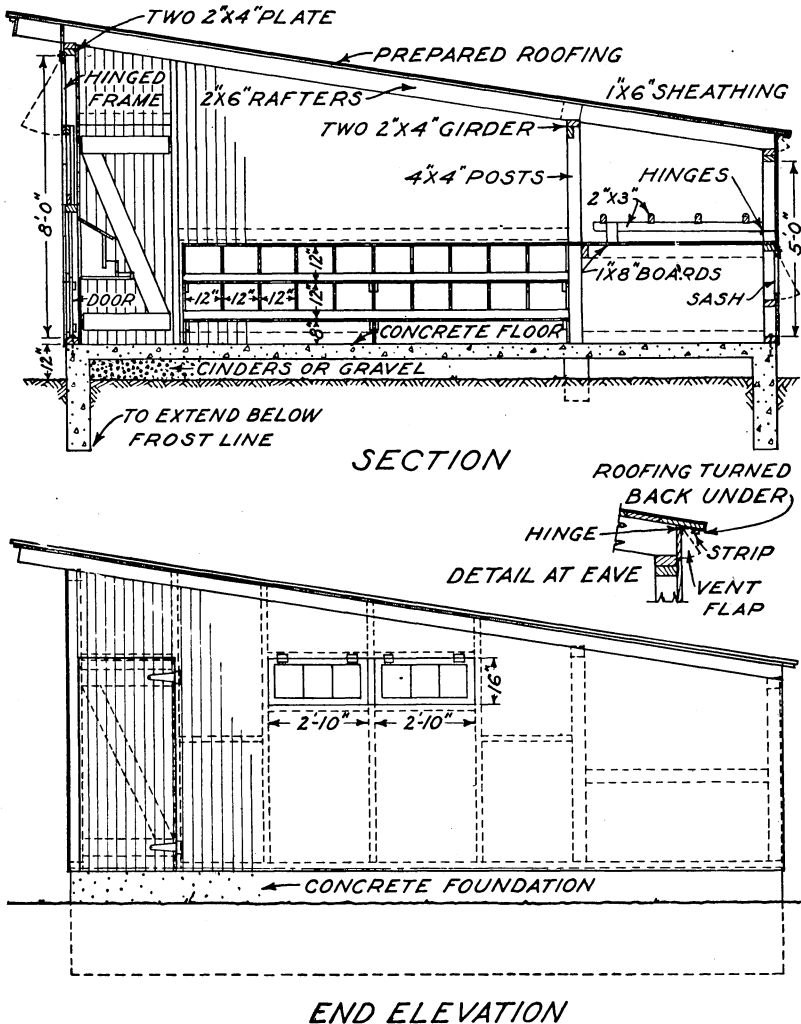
Section and end elevation of the large shed-roof laying house shown in figures 16 and 17.
